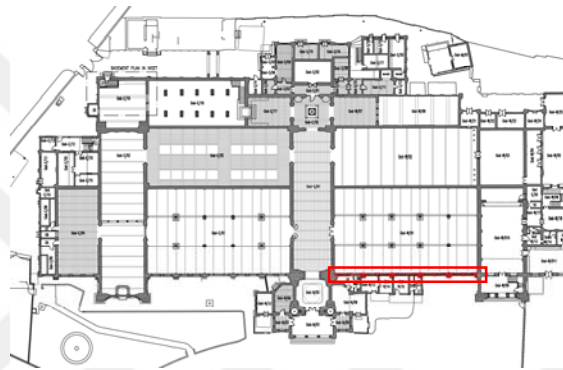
Key Plan showing wall Gnd-W/01-N-W
